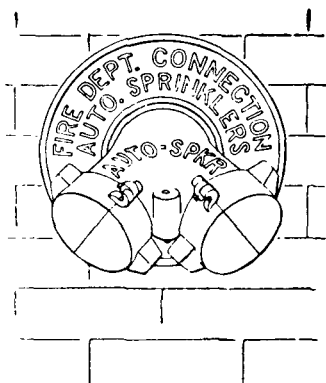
(a). Typical fire department connection to automatic sprinkler systems mounted on building wall showing 2½-inch intakes which would be supplied by lines from one of the first responding pumpers.
